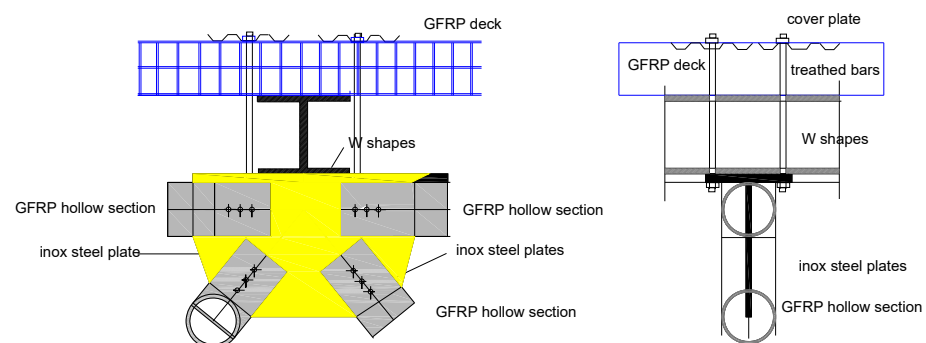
Proposed deck-to-girder connection and truss elements in the joint connection.
